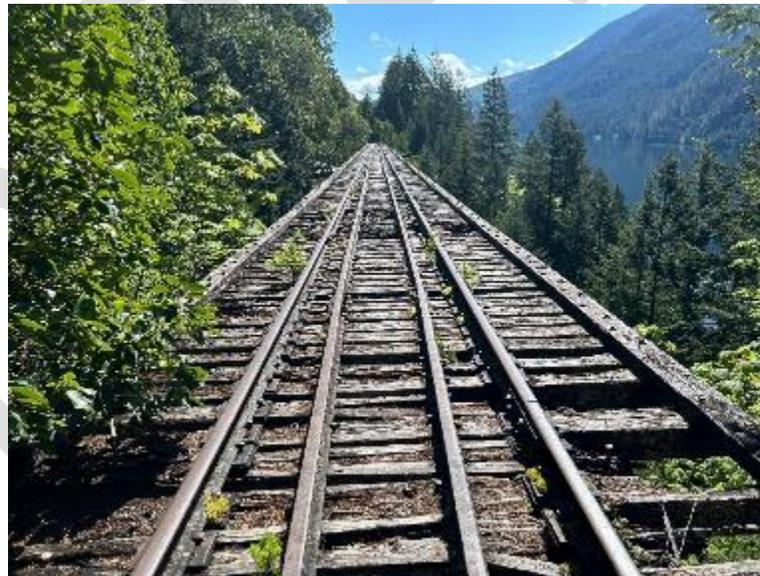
Bridge at Mile 14.6 – South Elevation Looking East
